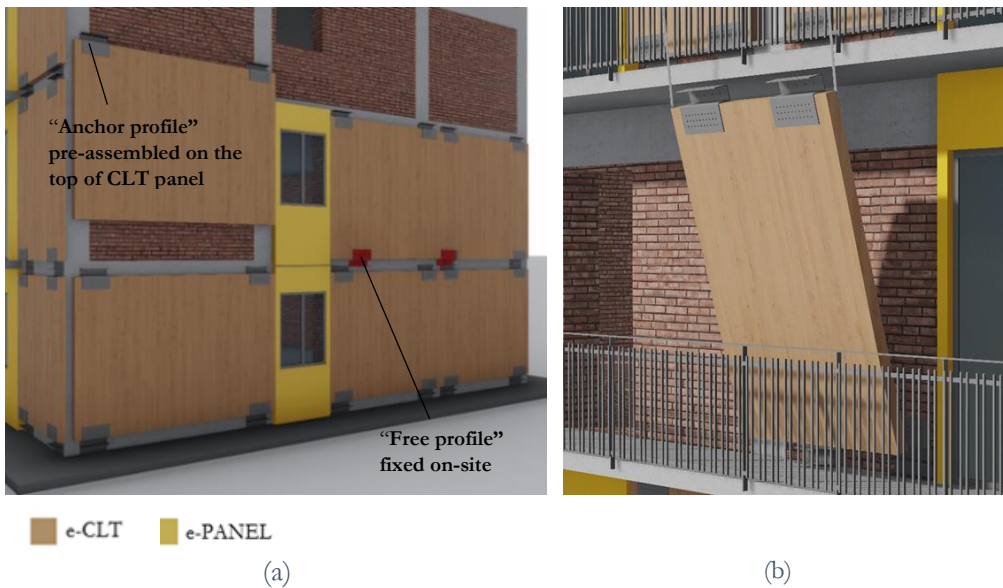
Installation of the e-CLT panels equipped with proposed friction dampers in (a) no-balcony façade and (b) balcony façade. (e-CLTs and e-PANELS are reported without insulation and cladding layers).
